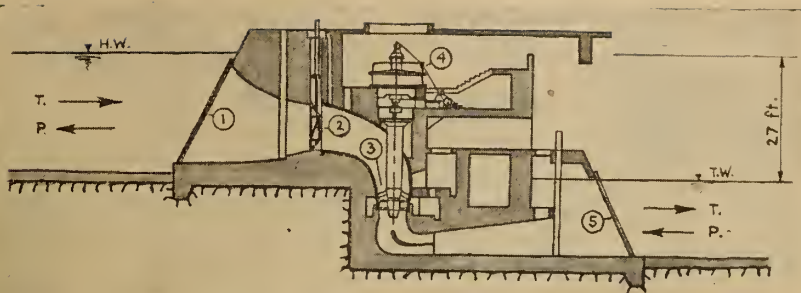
Kaplan-type Reversible Pump-Turbine.
